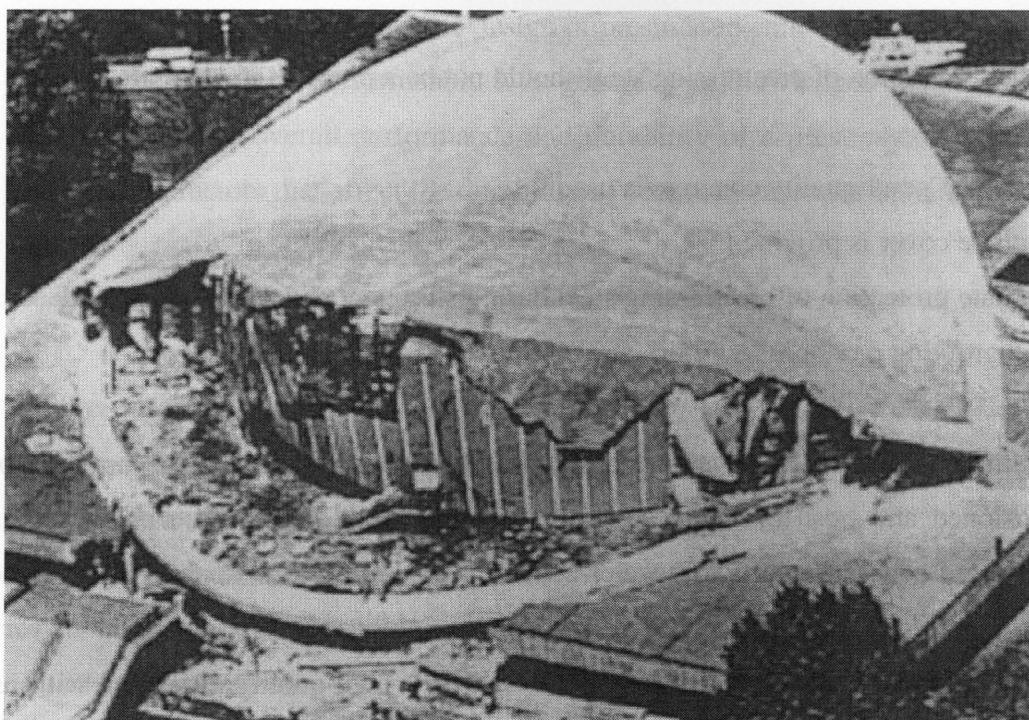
Partial collapse of West Berlin Congress Hall [114]
